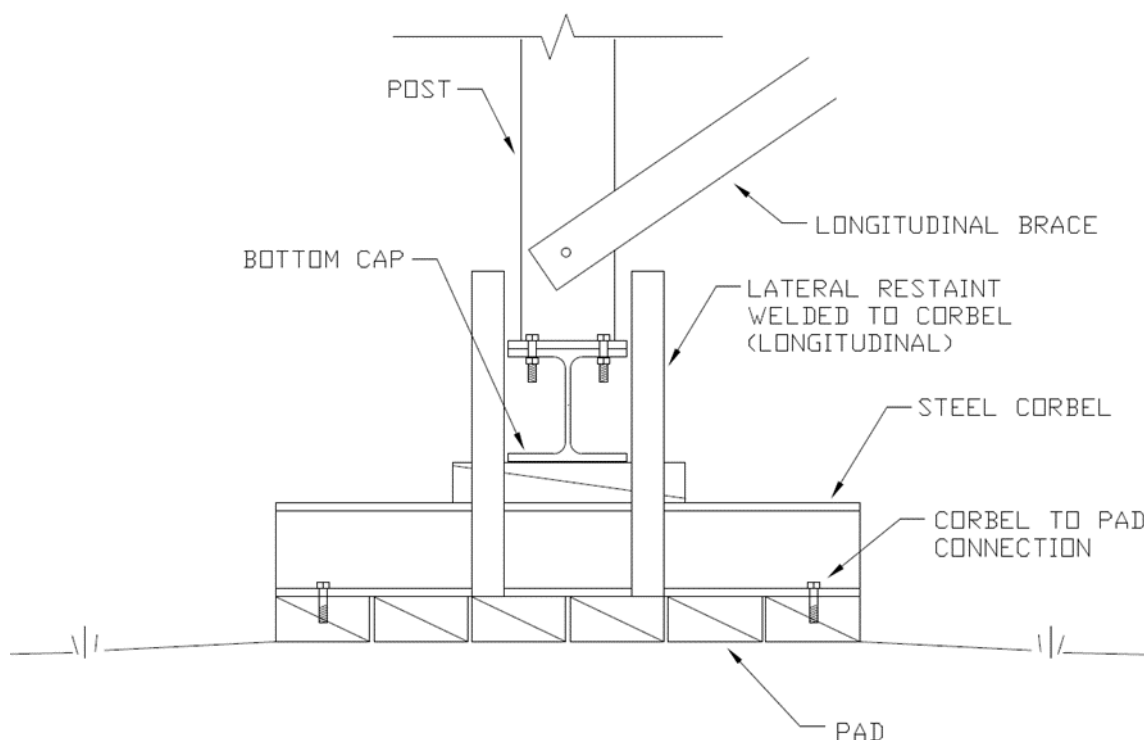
Typical Mechanical Connection Allowing Adjustment (vertical)
